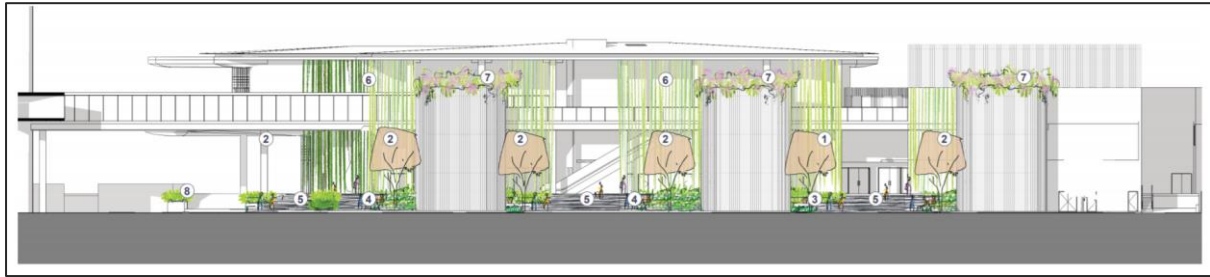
| 'The Laneway' landscaping (Source: Applicant's RtS)
